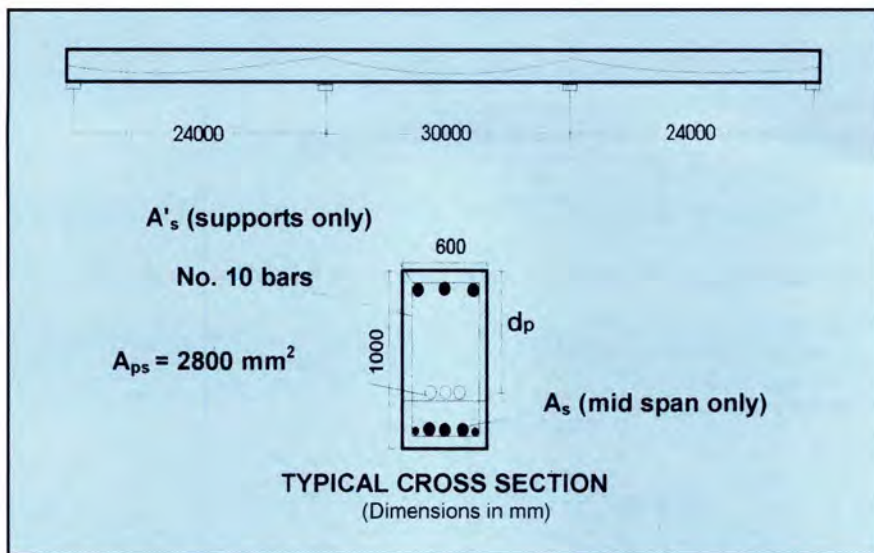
Profile and cross section of three-span beam used in parametric study.
